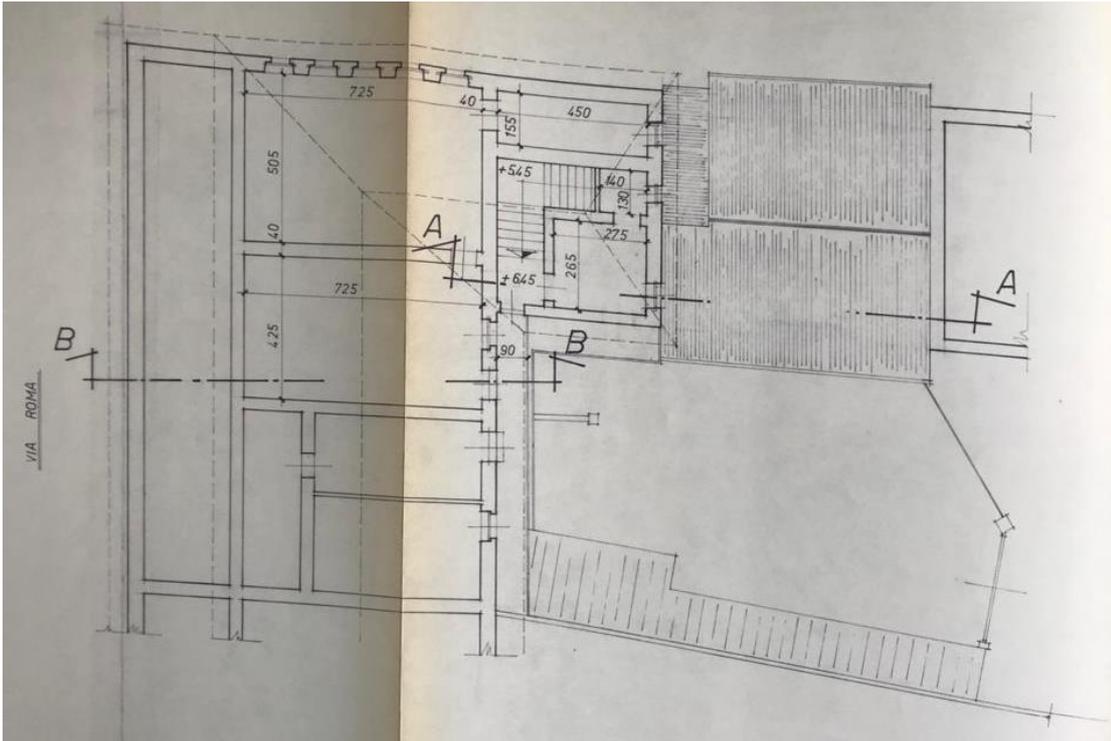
Attic floor plan (Via Alfieri 2)
